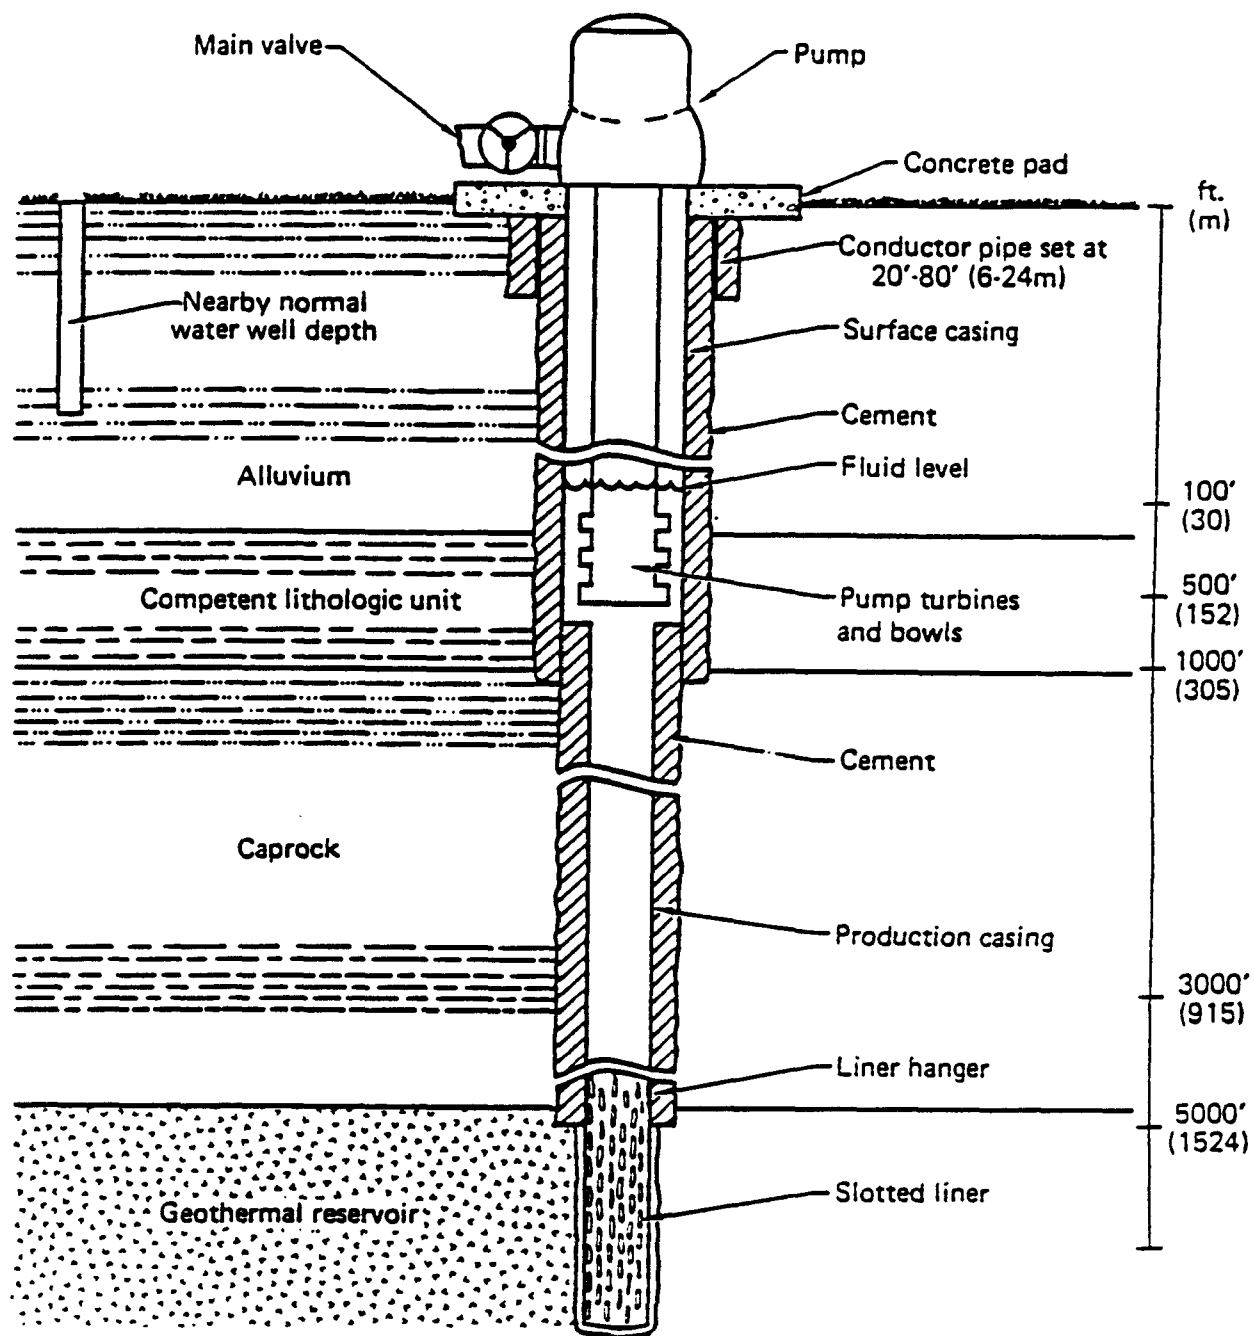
Cross Section of a Typical Hydrothermal Well (not to scale).
